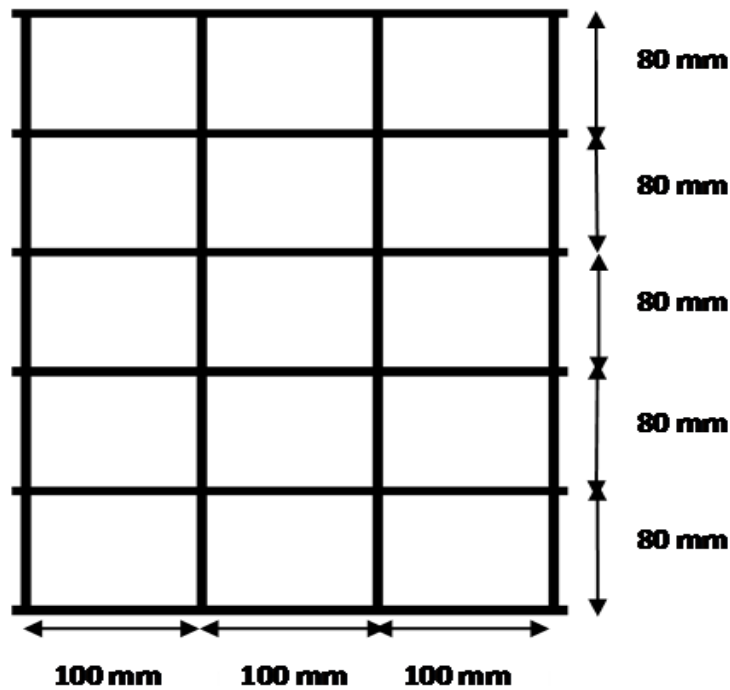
Layout of a reinforcement Layer used in preparing cages
